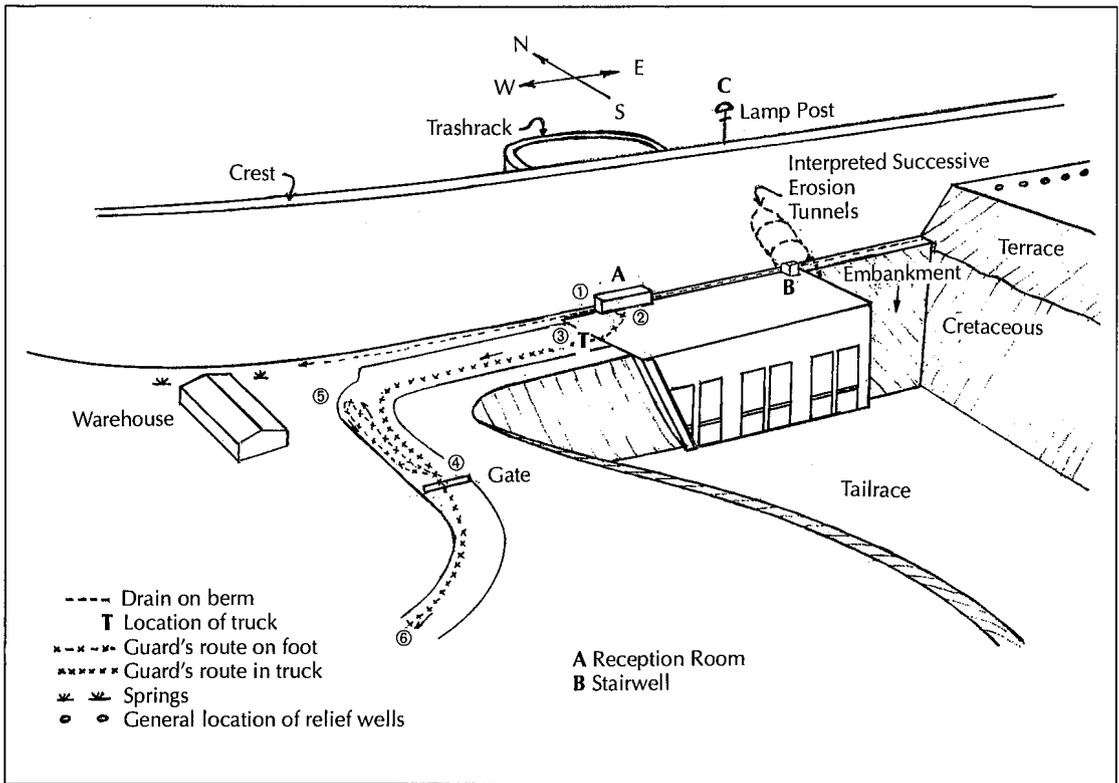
Principal features of the Walter Bouldin Dam as related to its failure.
